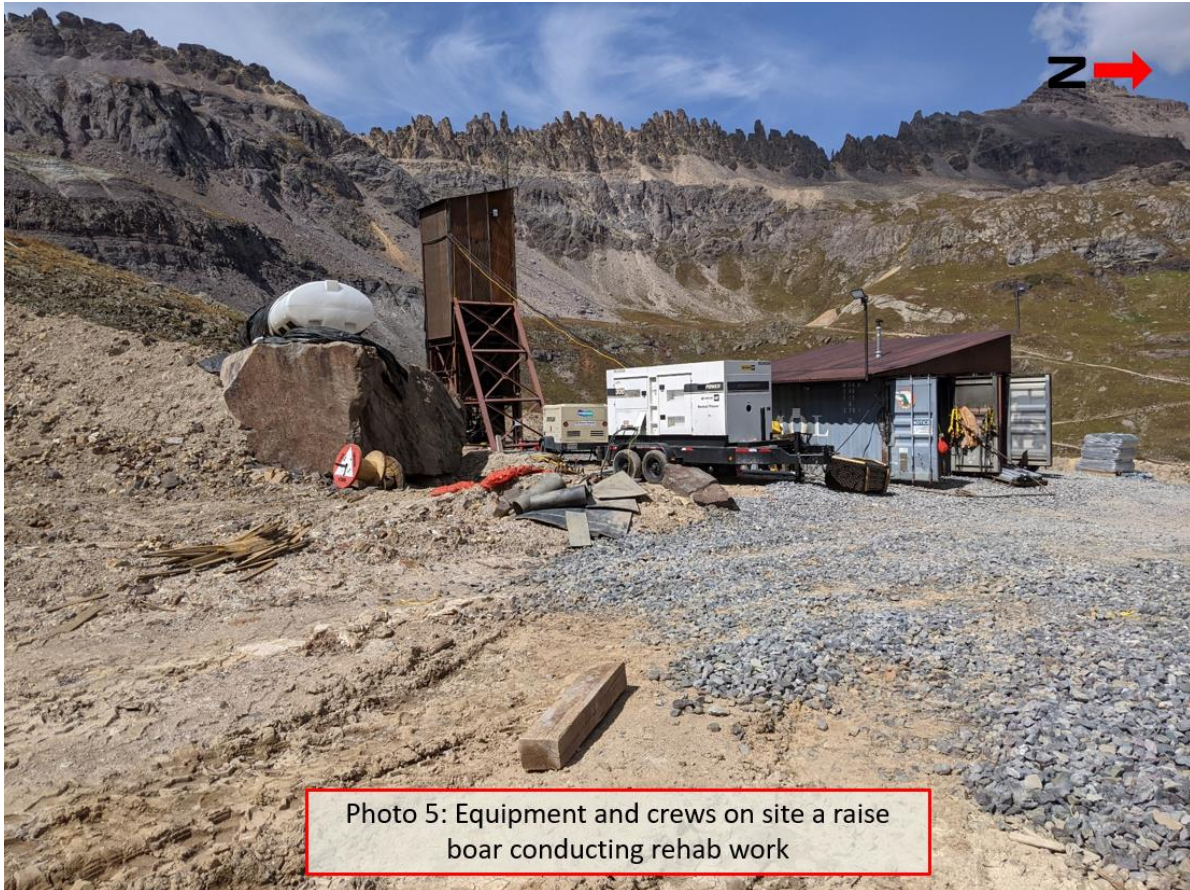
Equipment and crews on site a raise boar conducting rehab work
